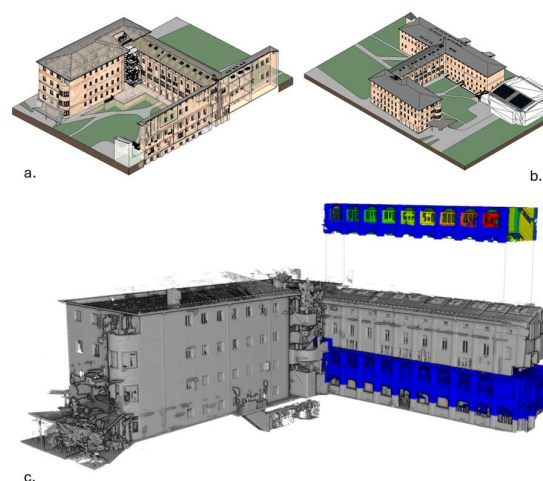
View of the Santa Chiara buildings (a and b). The first floor of the central wing used in the experiments (c).
